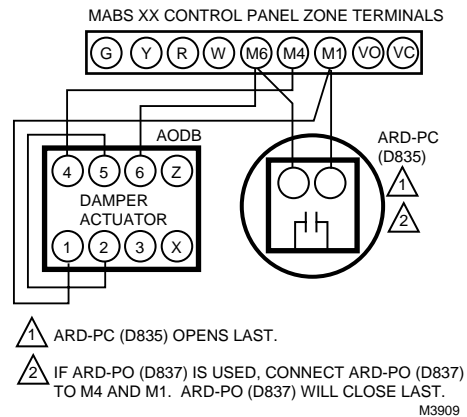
Single and tandem slave damper wiring for rectangular dampers.
